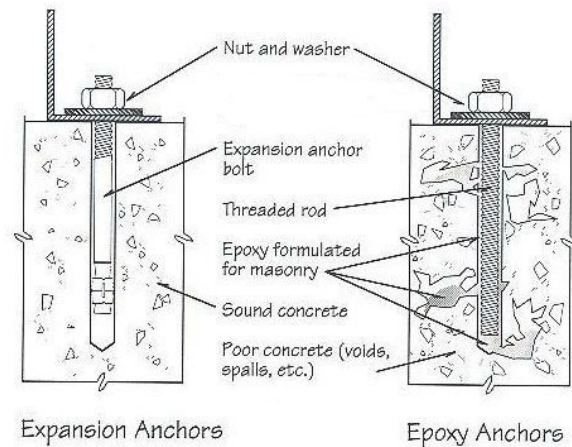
Typical examples of Expansion Anchor & Epoxy Anchor types
